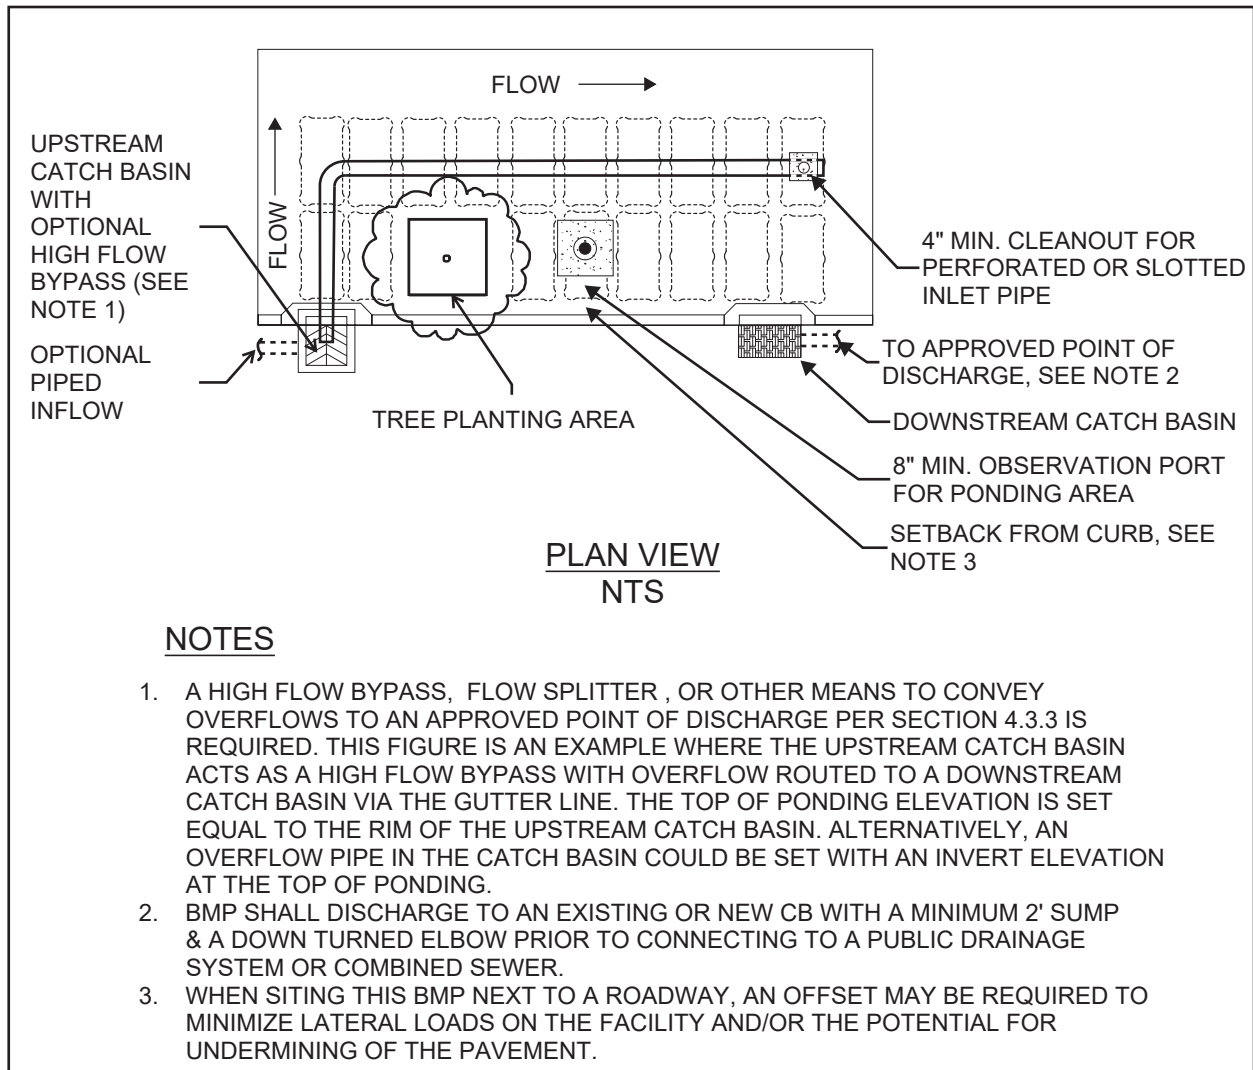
Example Infiltrating Soil Cell Bioretention (without Underdrain) Plan.
